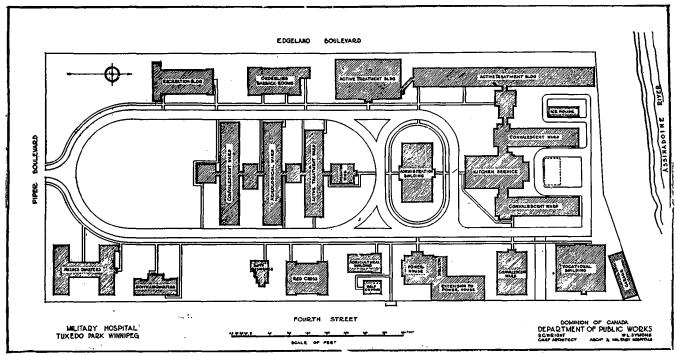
BLOCK PLAN, TUXEDO PARK HOSPITAL
